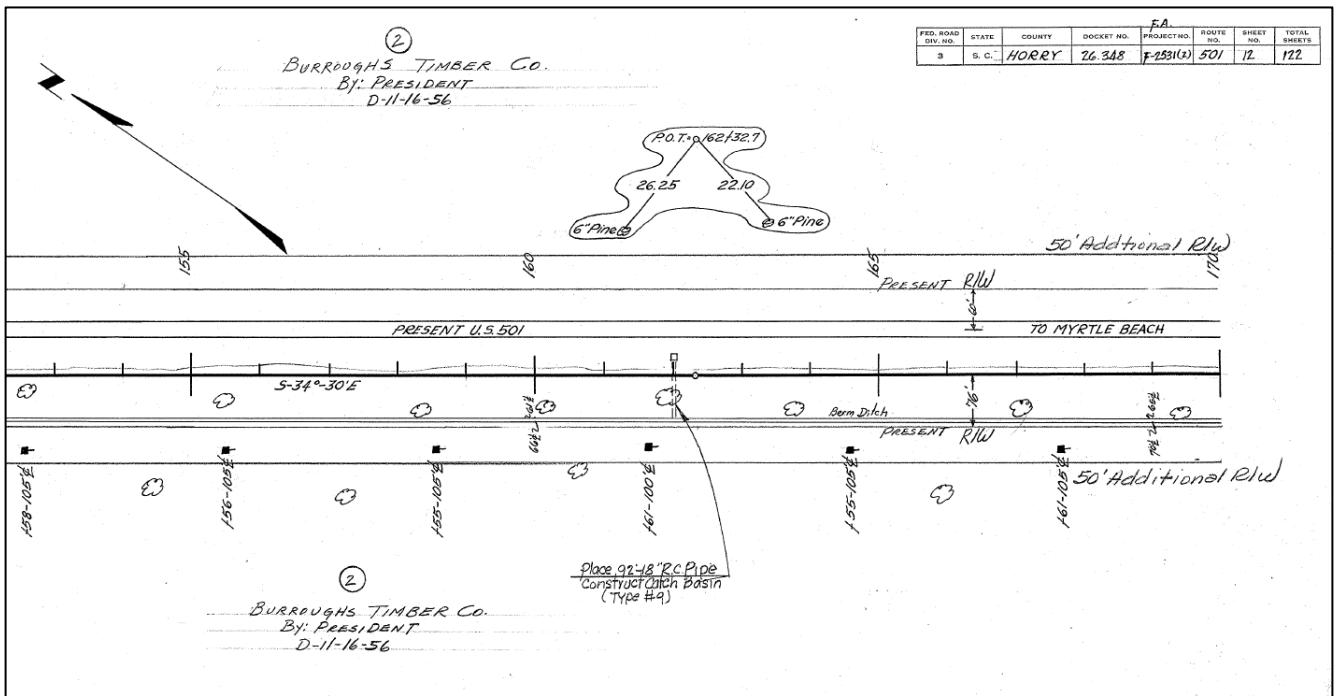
Example Existing and Proposed New Right-of-way (1956)
